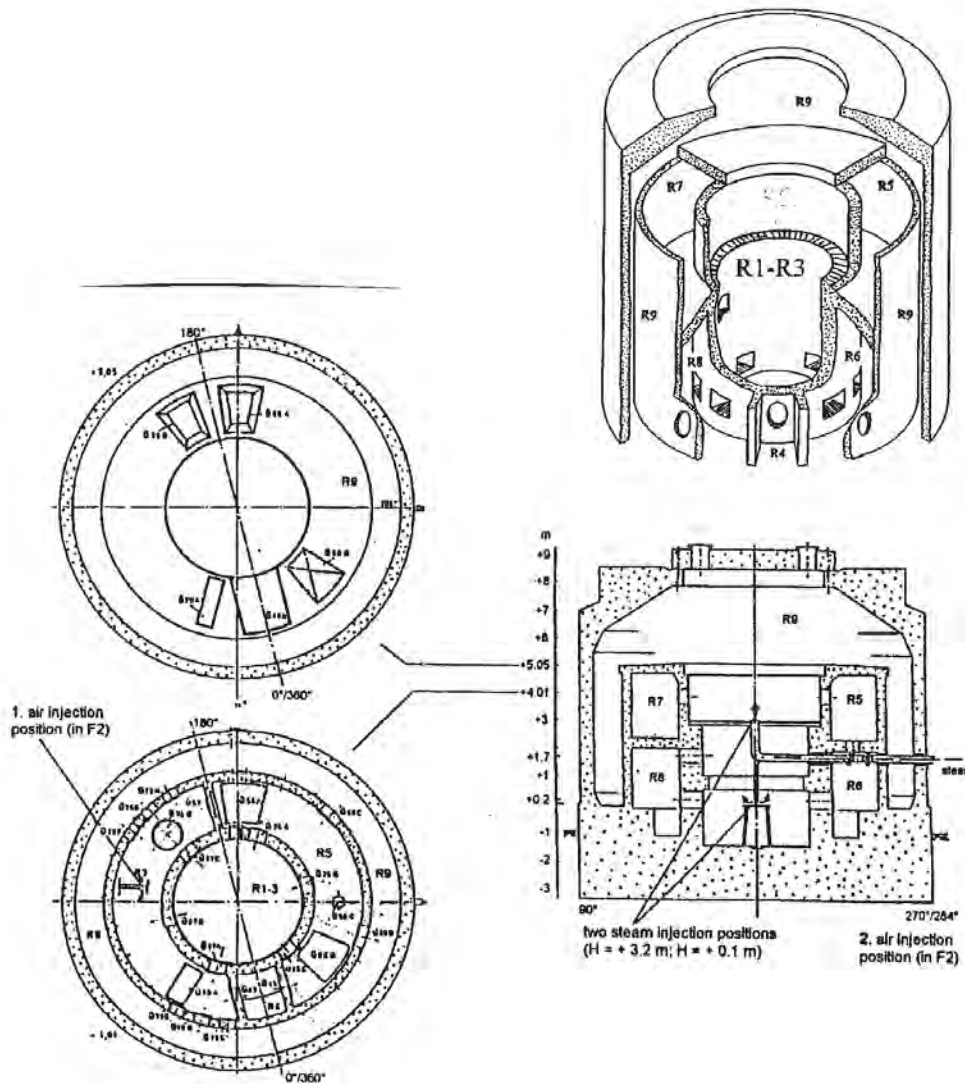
C-26. Model Containment: Vertical Cross-Section 0/180; Horizontal Cross-Sections at +4.01m and +5.05m for Configuration in Experiment F2
